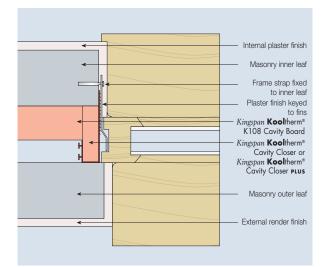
Jamb Detail Incorporating *Kingspan* Kooltherm® Cavity Closer at a Check Reveal
